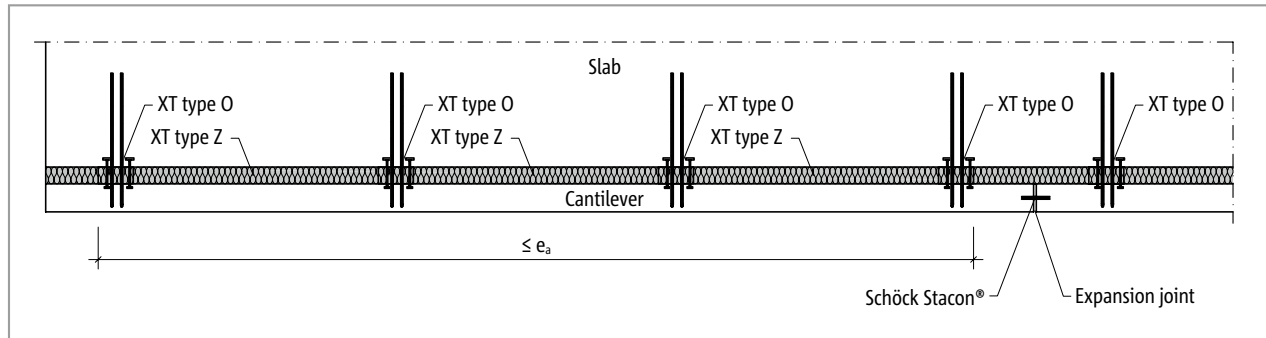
Schöck Isokorb® XT type O: Expansion joint arrangement
